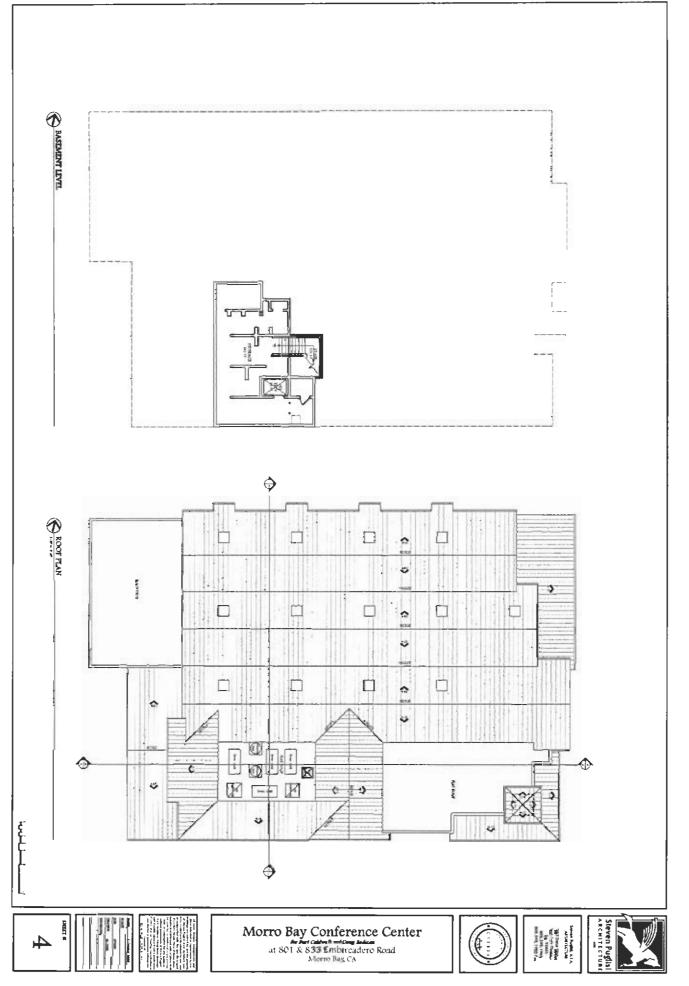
Exhibit B Proposed Site Plans and Elevations Page 3 of 7
